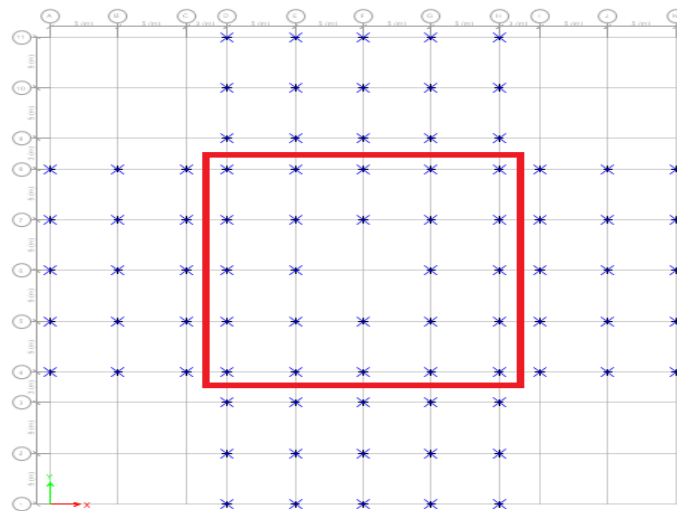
Plan Shows the Locations of providing the Base Isolator in the Building
